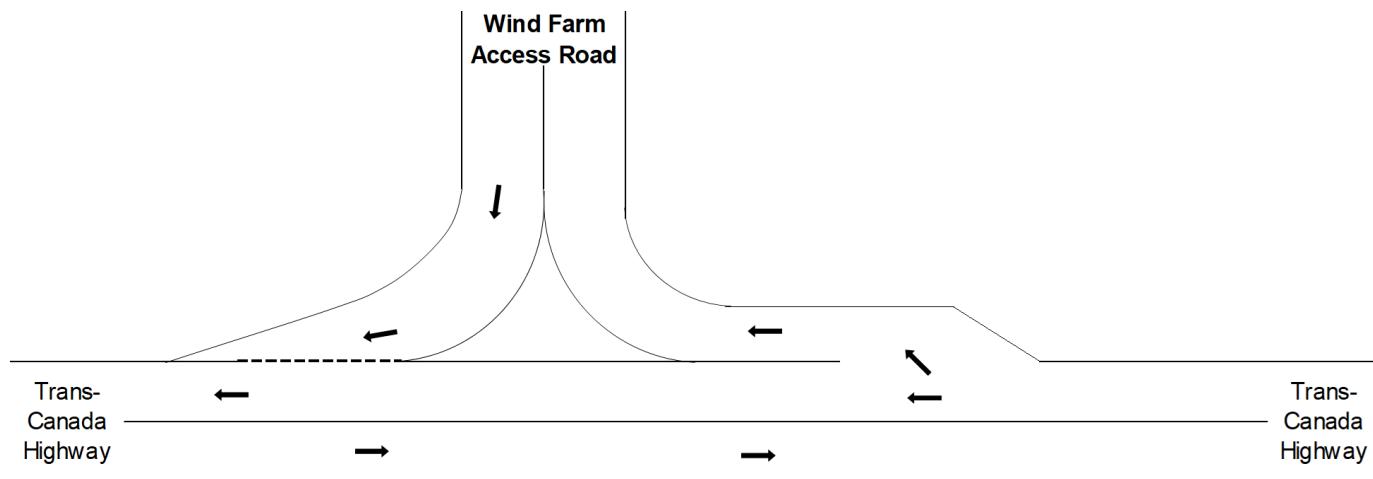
Trans-Canada Highway and Wind Farm access road – geometric configuration.
